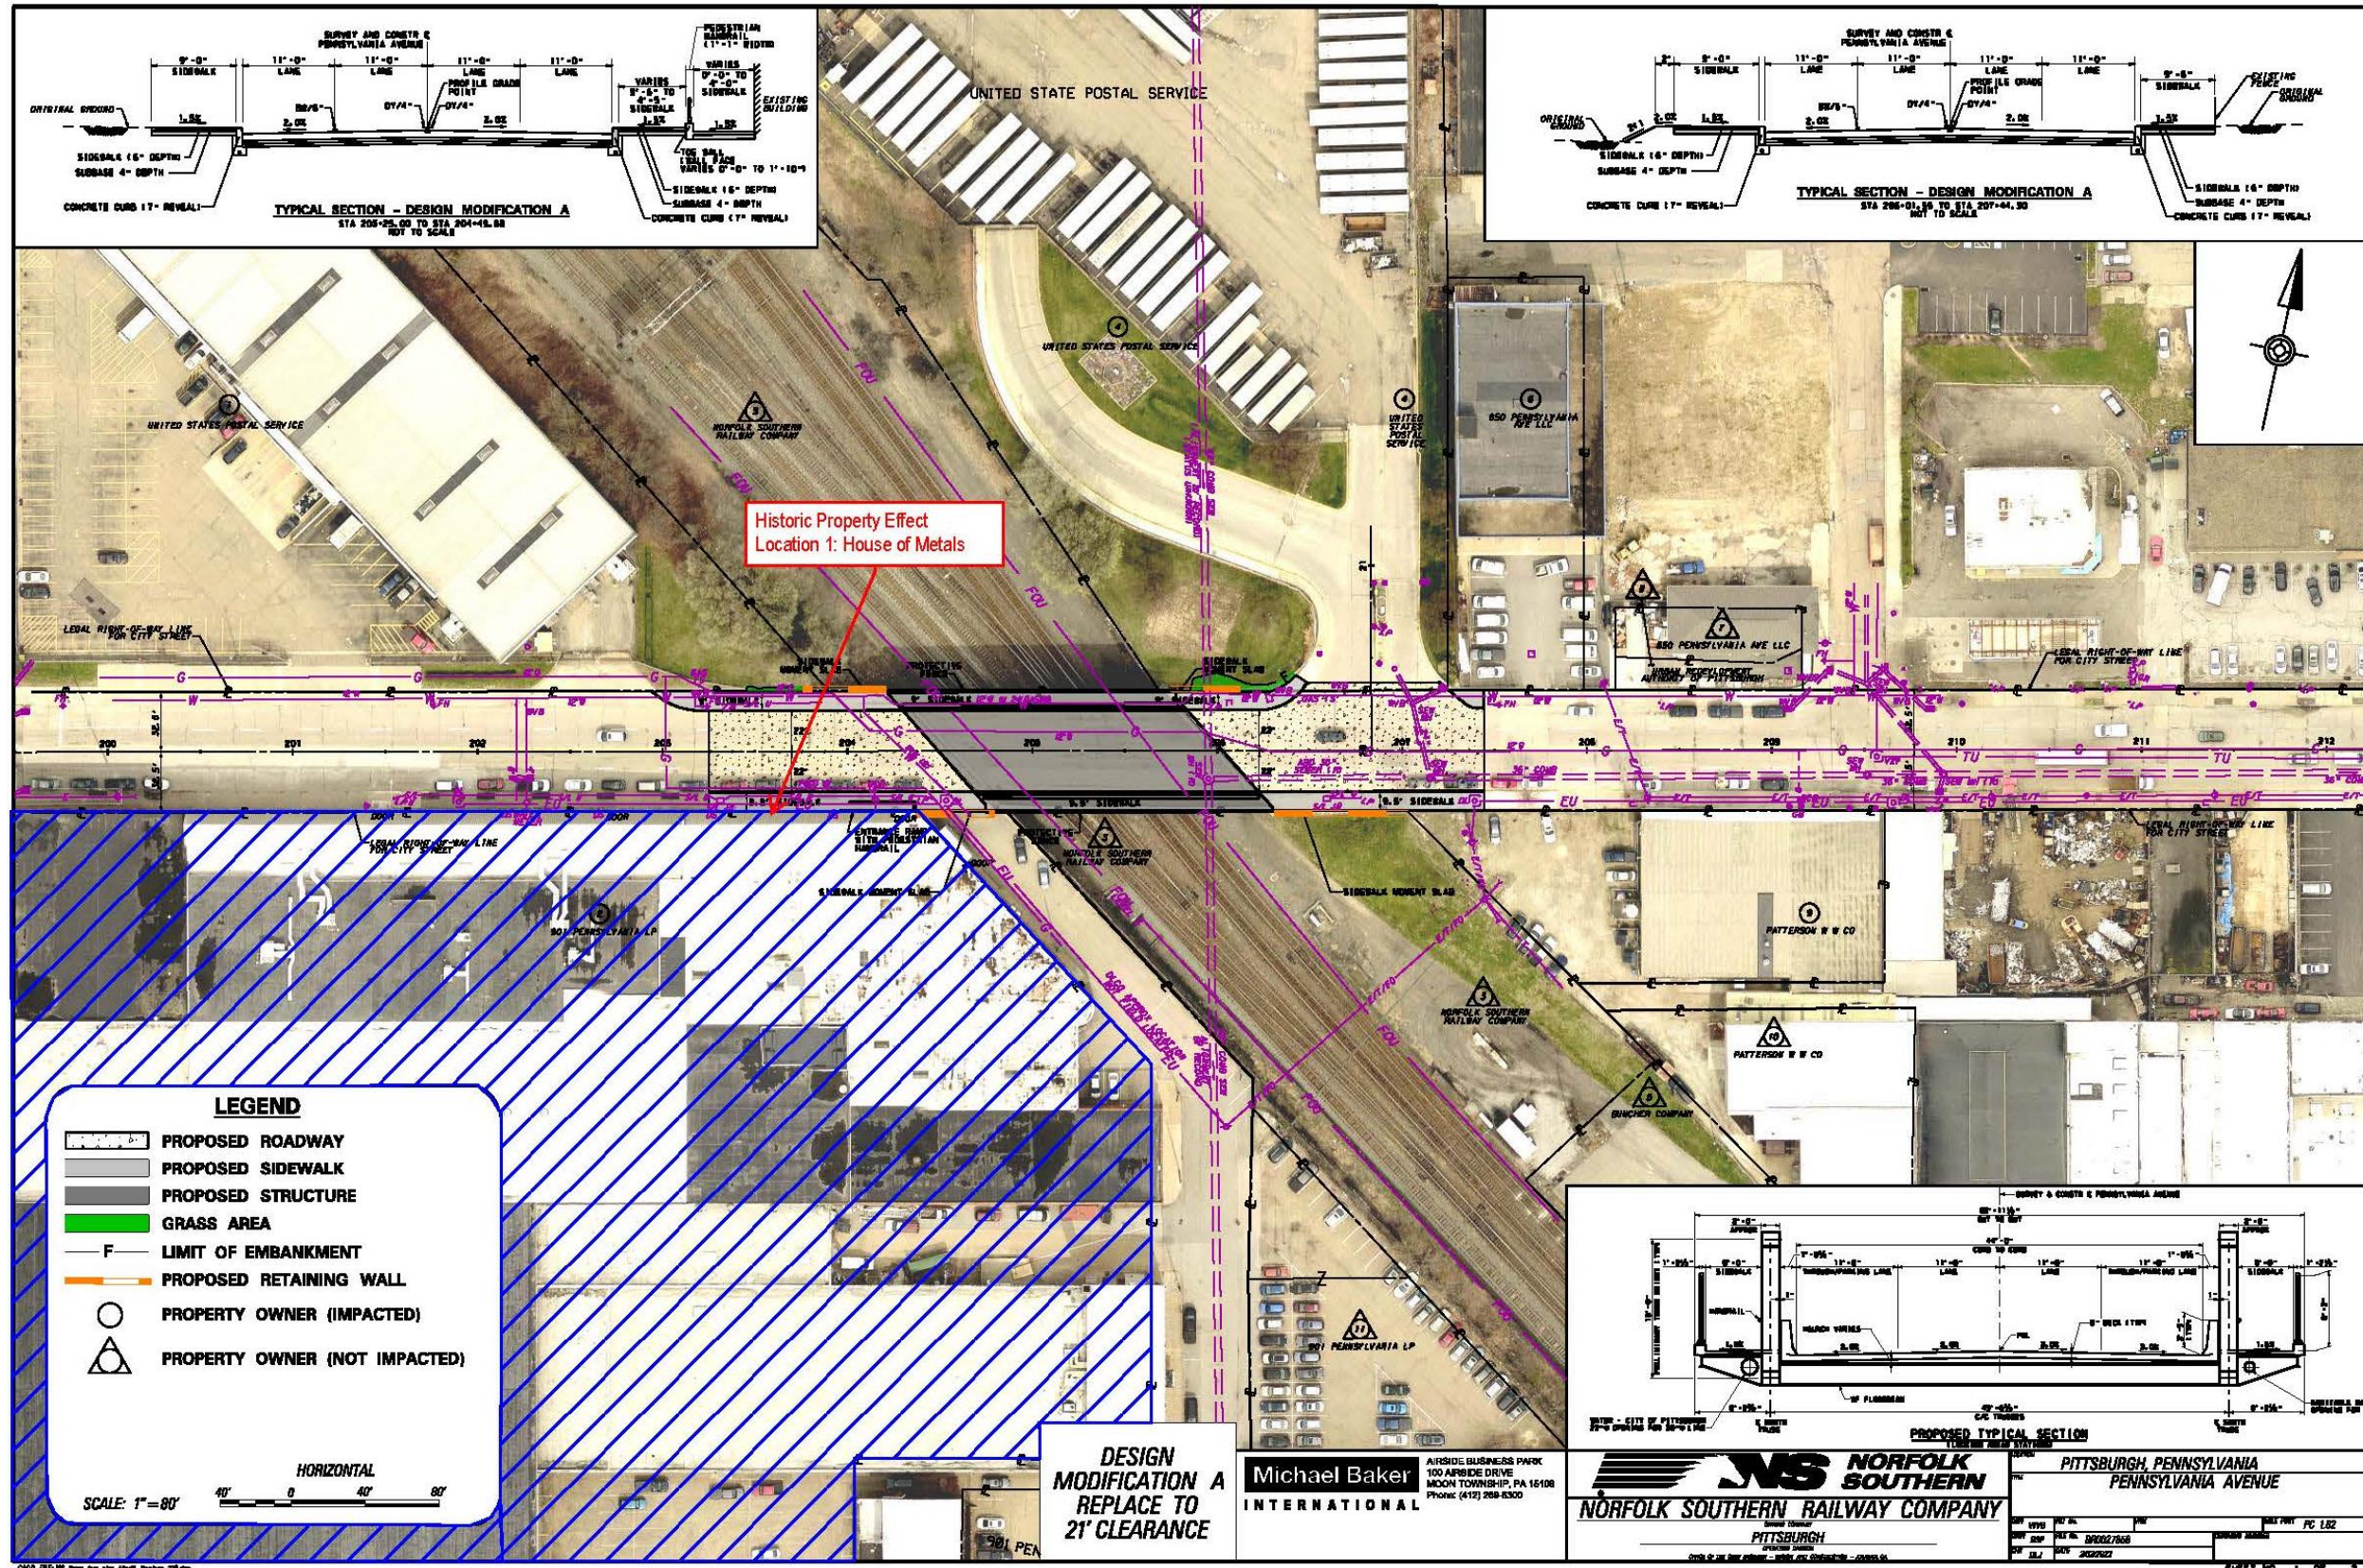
Plan sheet and profile views showing the proposed bridge structure and changes to the roadway, and sidewalks.
